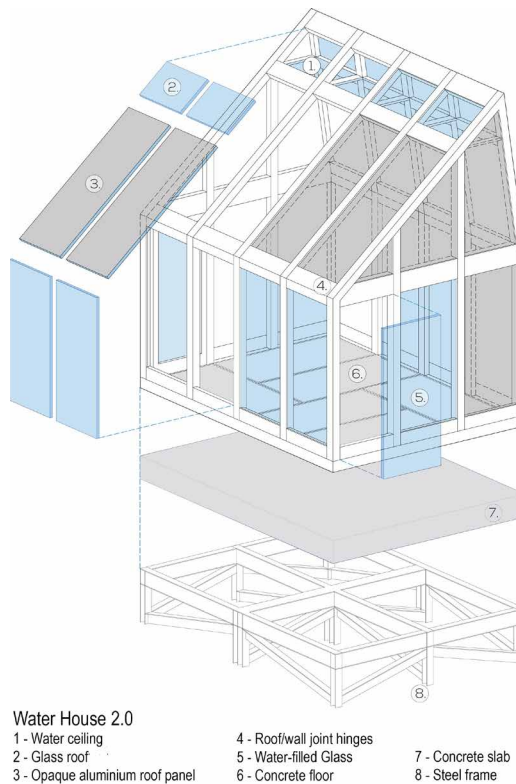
Water House 2.0 – exploded view of the structure (steel frame + panels). The panels were connected in a closed loop for this case as well, connecting south-facing panels (left side) with opposite north façade panels through roof panels and floor.
